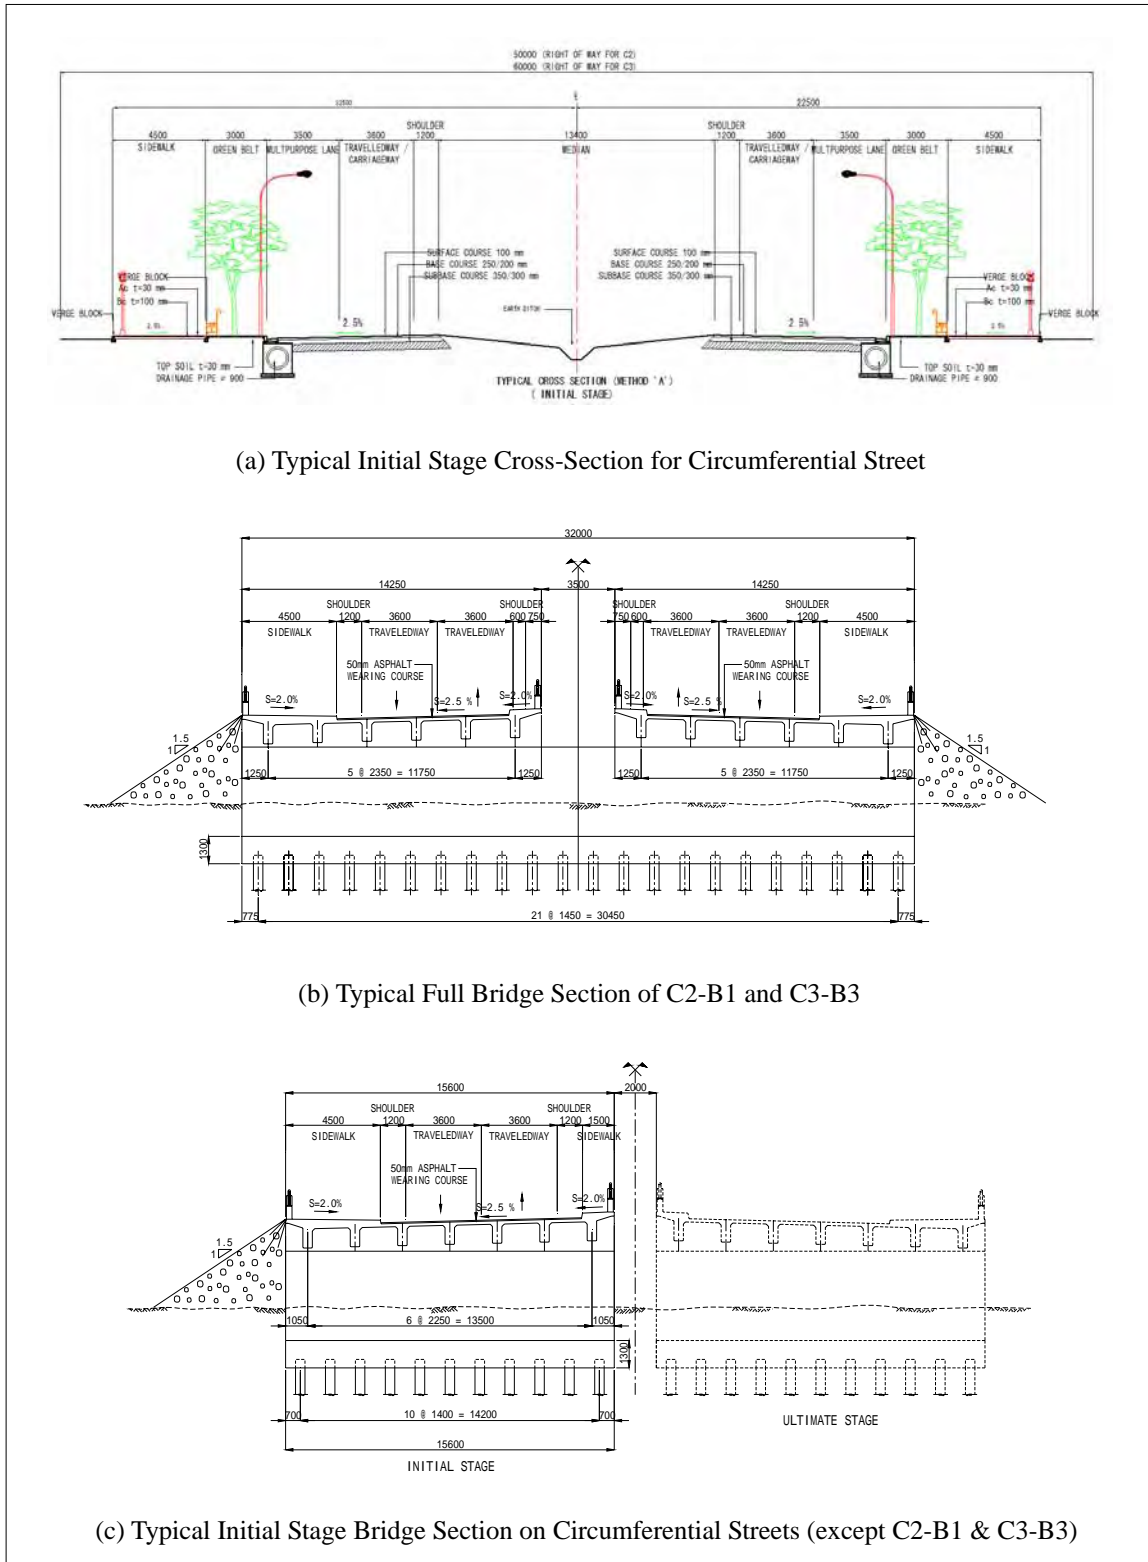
(1) Typical Cross-Sections of Bridges on Circumferential Streets
